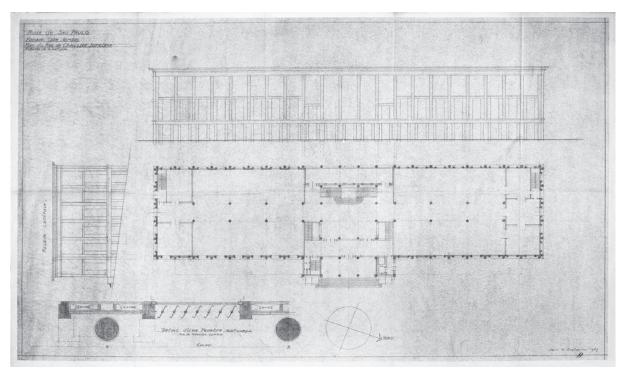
Auguste Perret, "Musée de Sao Paulo, Façade Cote Jardin, Plan du Rez de Chaussee sureLeve", São Paulo, Brazil, 1947. © Arquivo FAAP.
